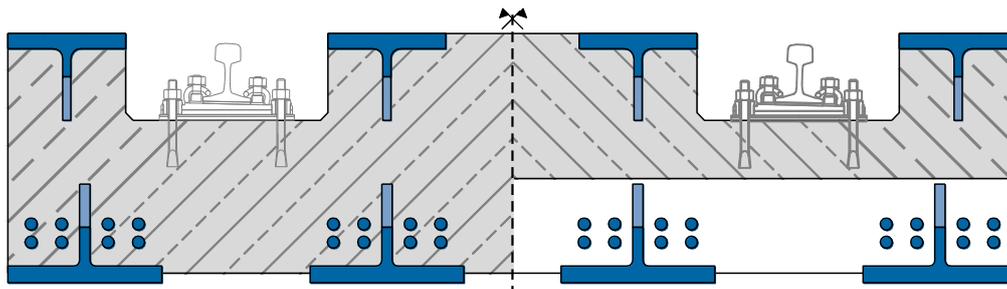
Cross section for condition I (left) and condition II (right), rail support point drawn in for illustration purposes only
